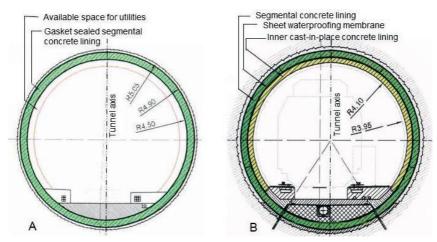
Two design options for tunnel linings in TBM excavated rail tunnels in rock. A: Single-shell undrained gasket sealed segmental concrete lining. B: Double-shell drained lining with outer segment concrete lining and inner cast-in-place concrete lining. (After Strappler et al. 2012)
